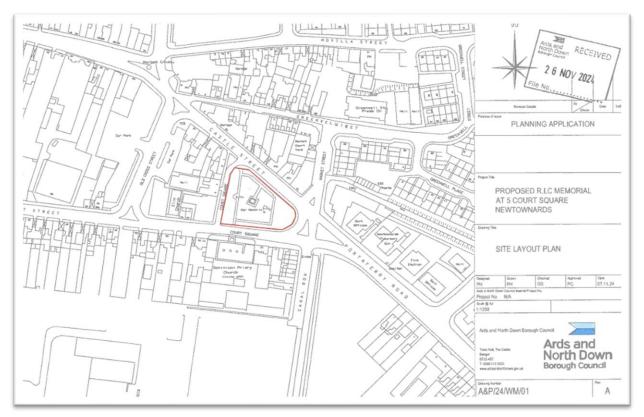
Submitted Site Location Plan, showing context of surrounding area.
